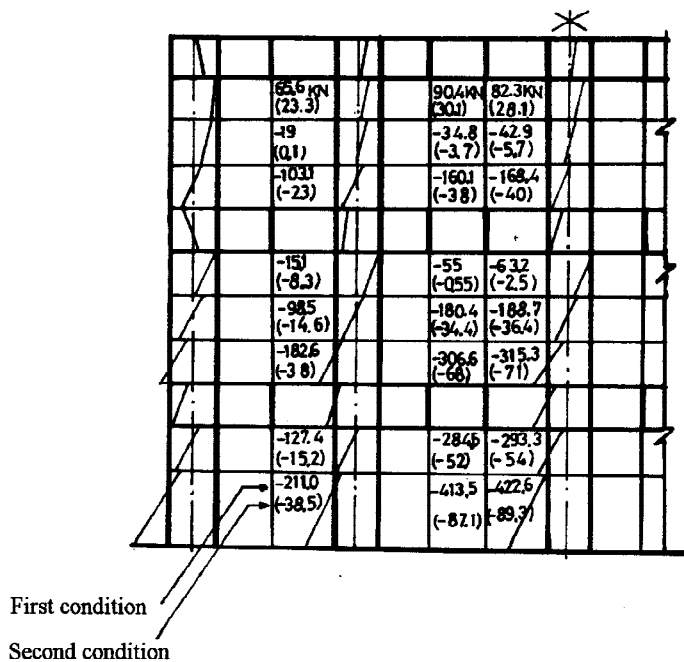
Column moment of mega-frame under earthquake action (figures indicate axial loads of sub-frame column under vertical loading)
